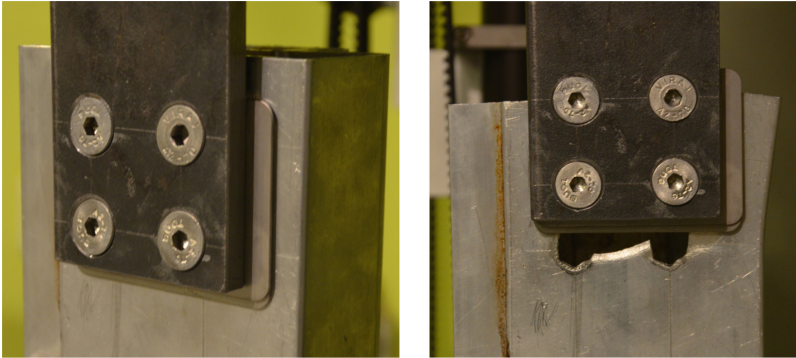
Sample 2 – after slip of stainless steel washers(left), destroyed connection (right)
